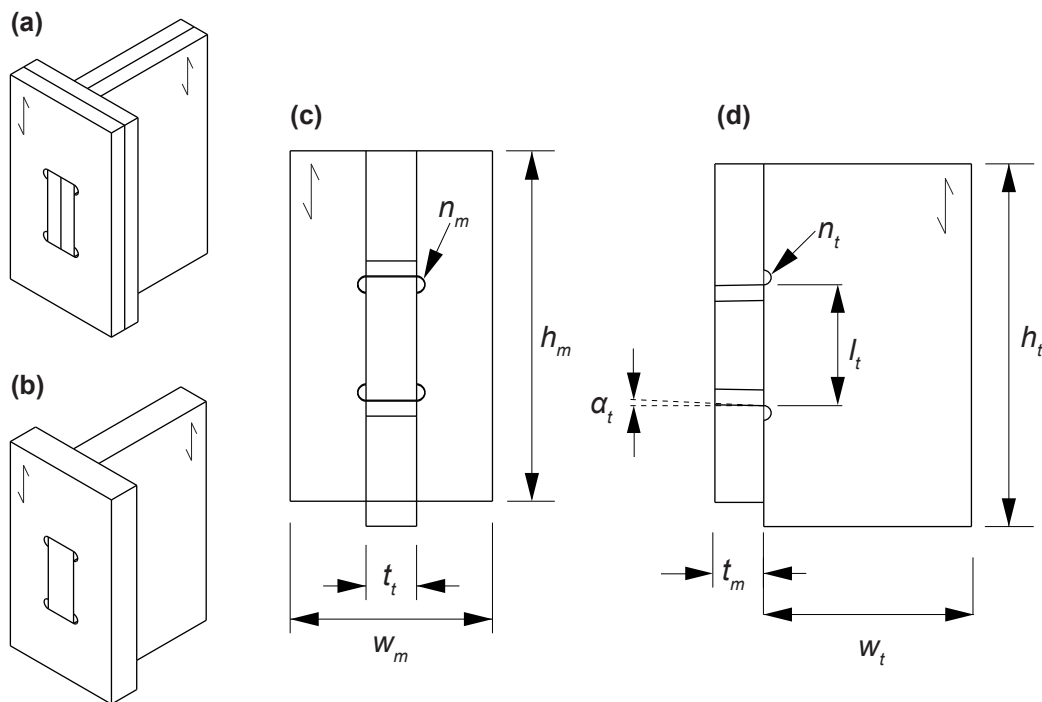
TT shear specimens: (a) Axonometry of single-layered type / (b) Axonometry of double-layered type / (c) Front view / (d) Side view.
